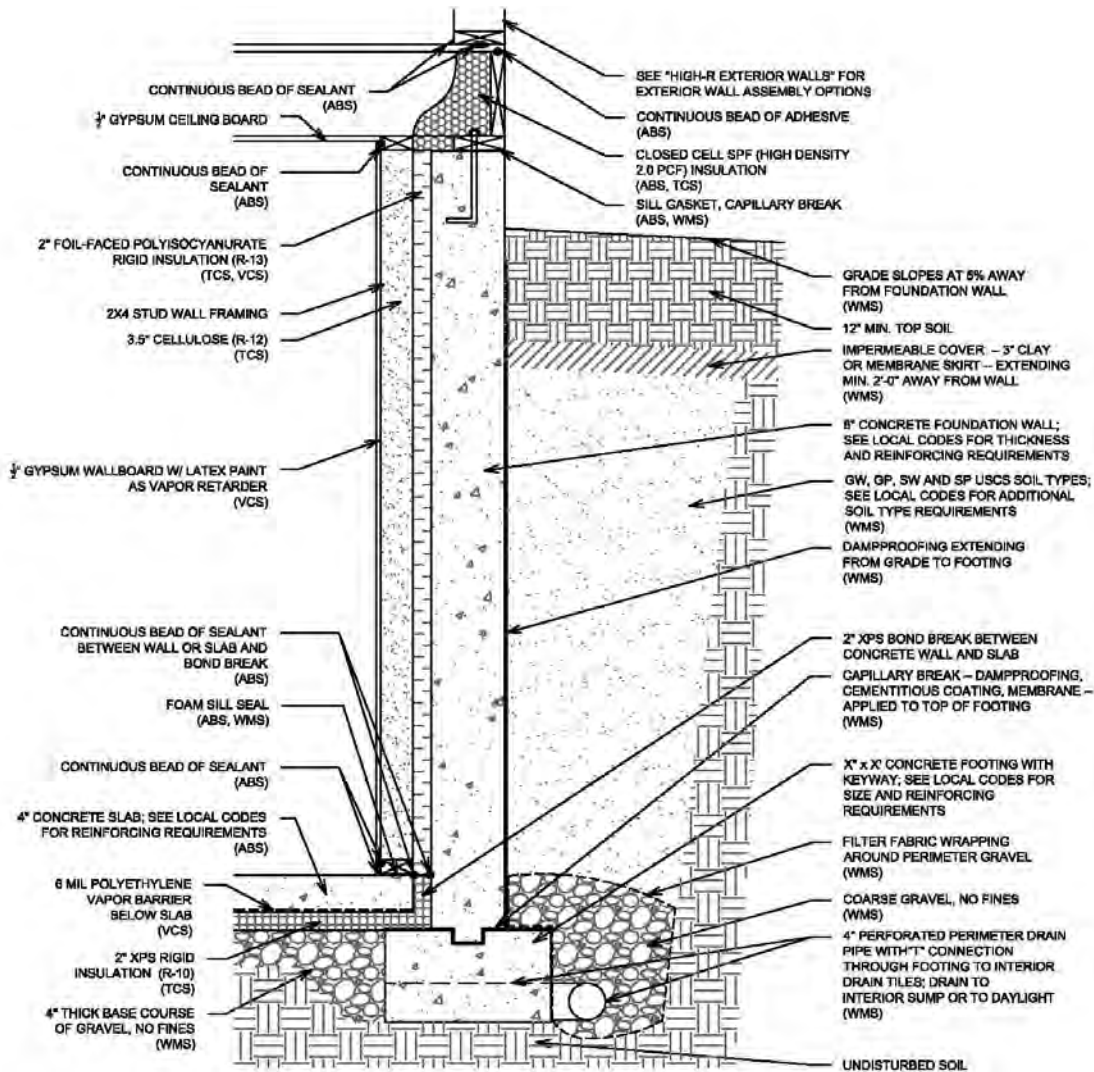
Case 9 Detailed Drawing – Recommended Foundation Wall System
